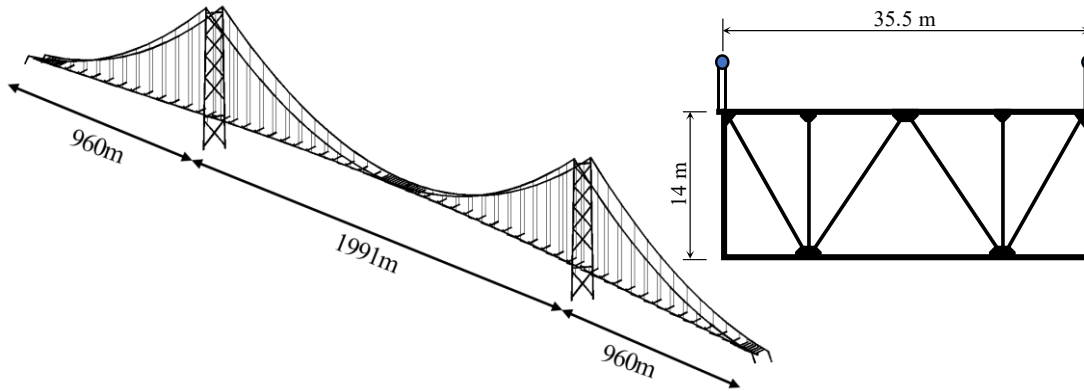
Finite element model of the Akashi-Kaikyo bridge and its deck cross-section
